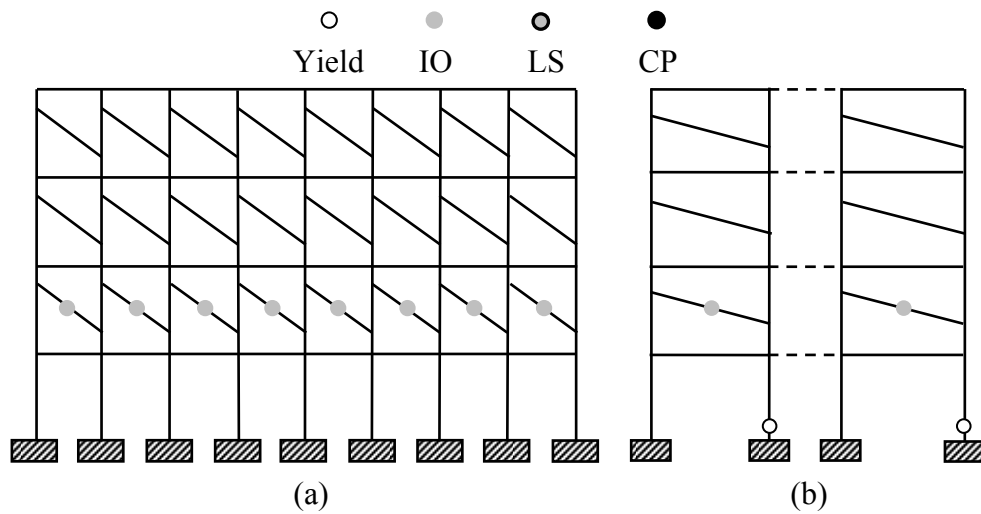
Hinge pattern at performance point for DBE of four storey RC infilled frame buildings with open ground storey, designed as SMRF without considering provisions of BIS (2002) for open ground storey: (a) typical longitudinal frame; (b) typical transverse frame.
